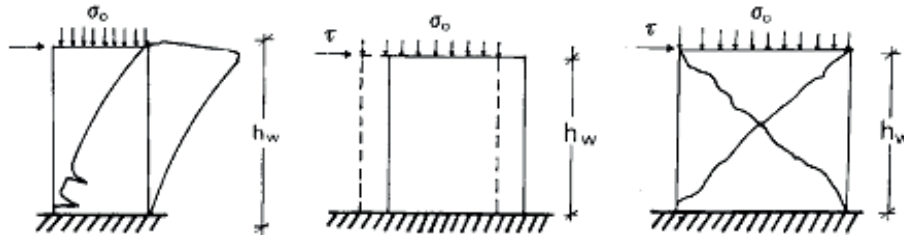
In-plane failure modes of masonry walls a) rocking; b) sliding; c) diagonal cracking
